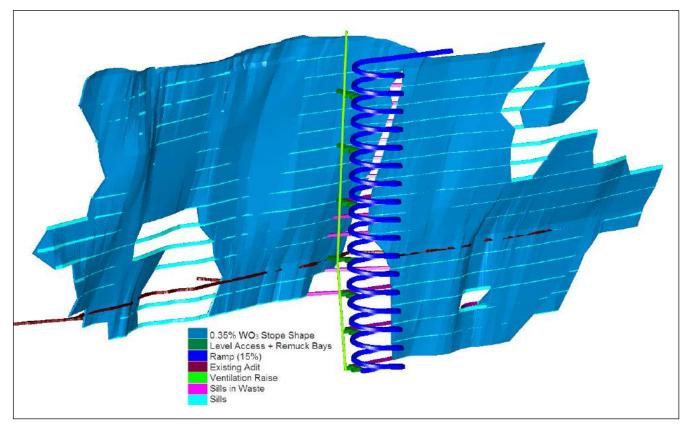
Conceptual mine development layout (looking northwest with no scale)
